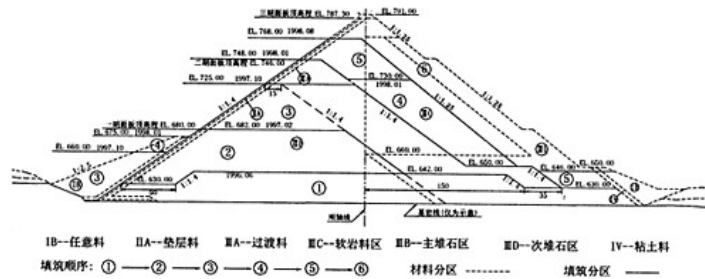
Embankment zoning of face slab rockfill dam for Tianshengqiao-1 hydropower station.
